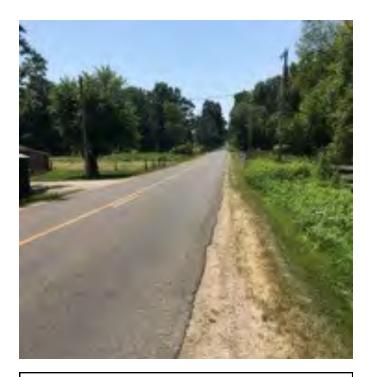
Facing south — view of CR 29 south of U.S. 20.
